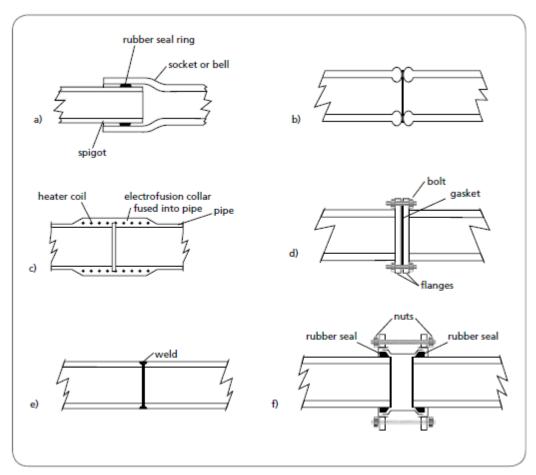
Common types of pipe joints: a) spigot and socket; b) butt welded; c) electro fusion) Flanged; e) welded; f) mechanical coupling.
